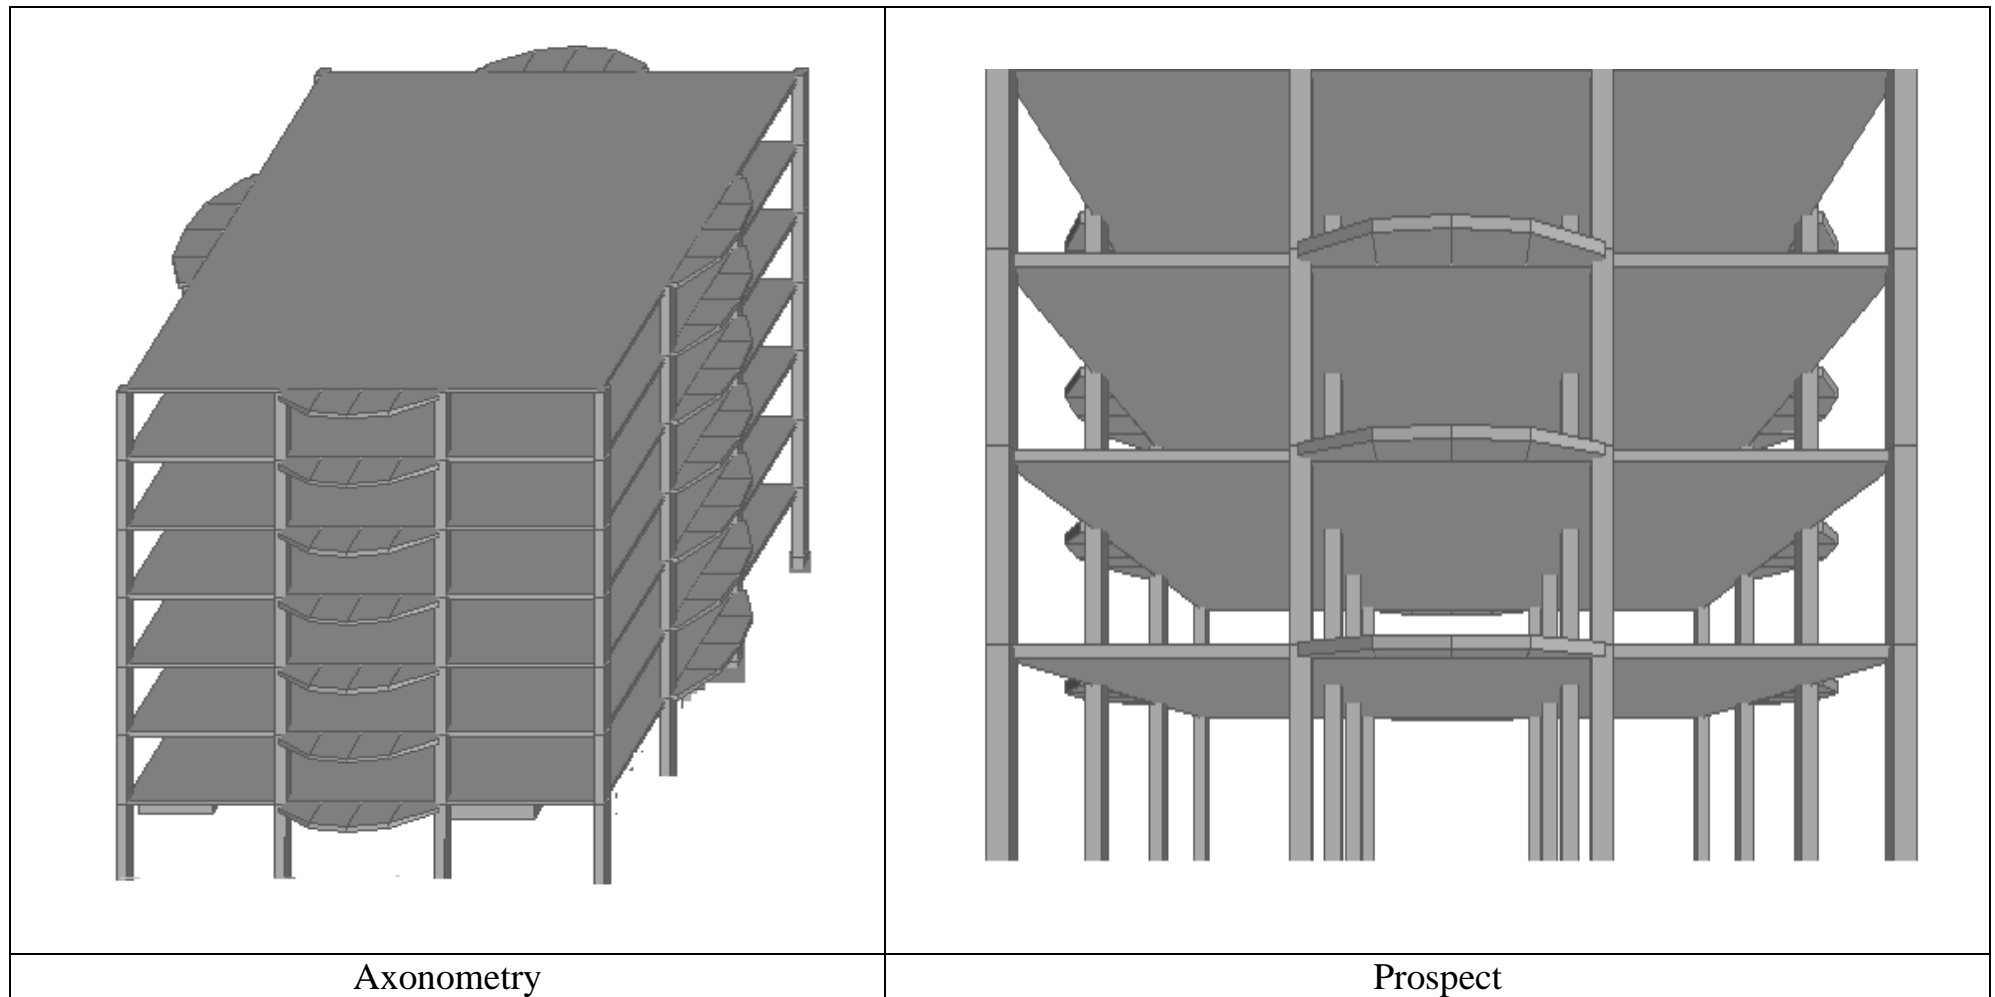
Building's model with slab floors. Note: foundations are simply shown
